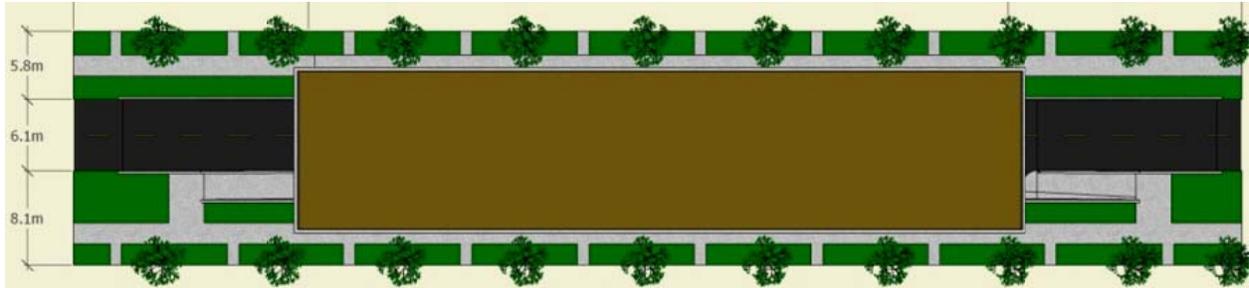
Tertiary Street - Option 8 - Roof Plan
